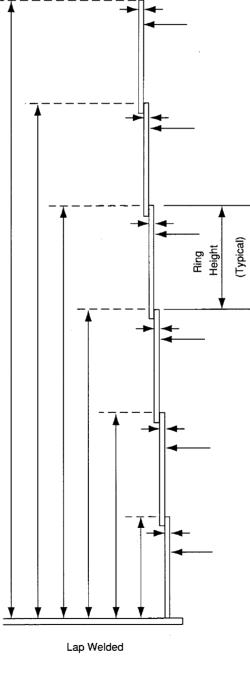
Measurement Locations for Welded Upright Tanks
